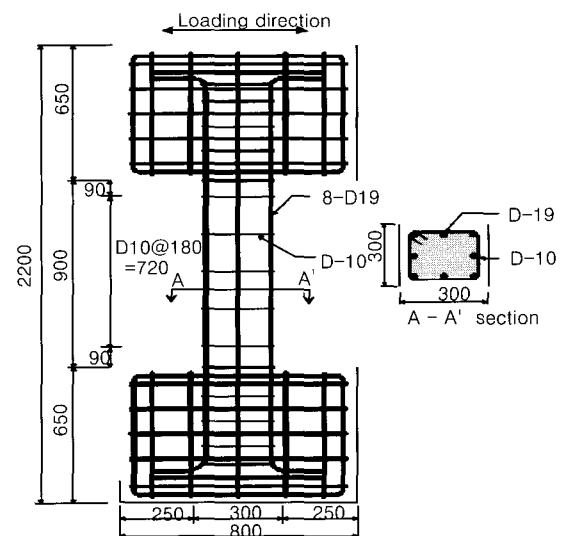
S<sub>1</sub> Series specimen dimension (Unit:mm)
